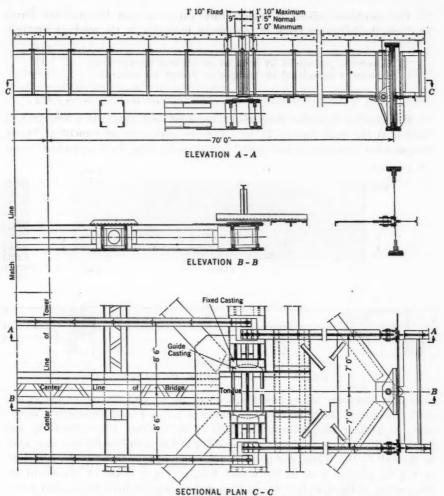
FLOOR EXPANSION DETAILS AT TOWER, SIDE SPAN.
